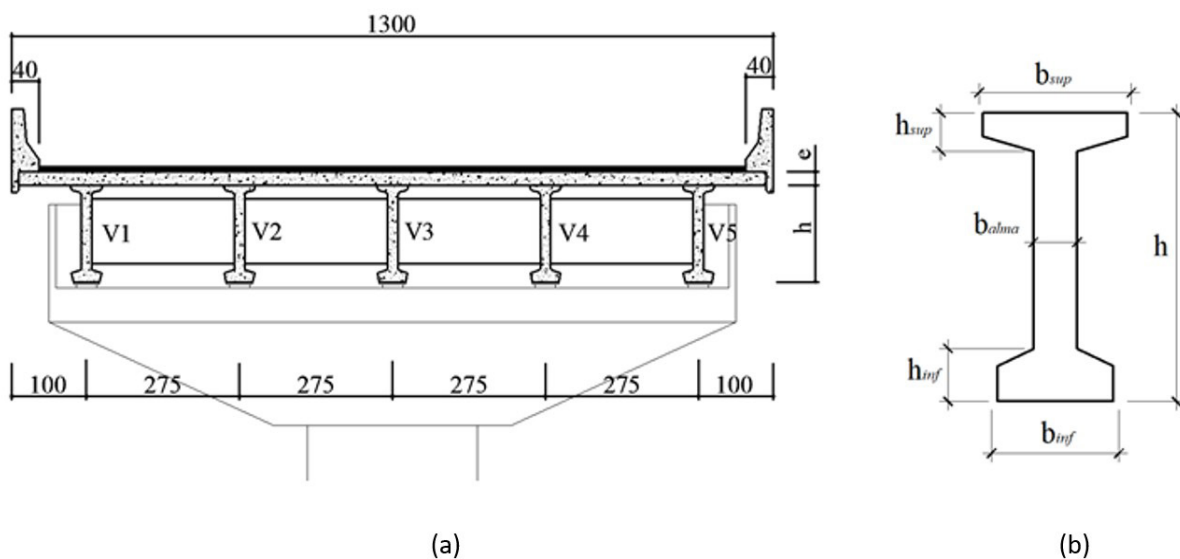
(a) Cross section adopted for 5-girder bridges. Units: cm; (b) girders I profiles.
